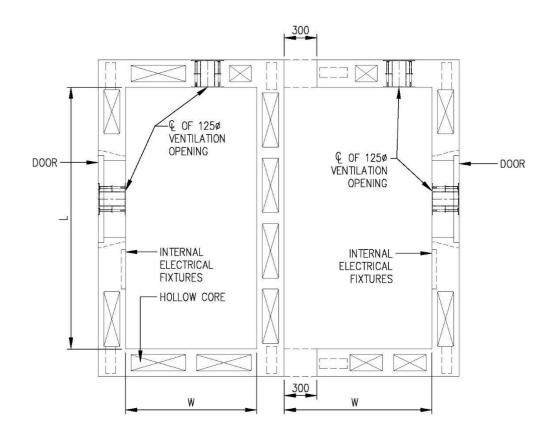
(a) PRECAST HS WITH HS DOOR ON LONGER WALL AND ONE OF VENTILATION SLEEVES ABOVE THE DOOR
